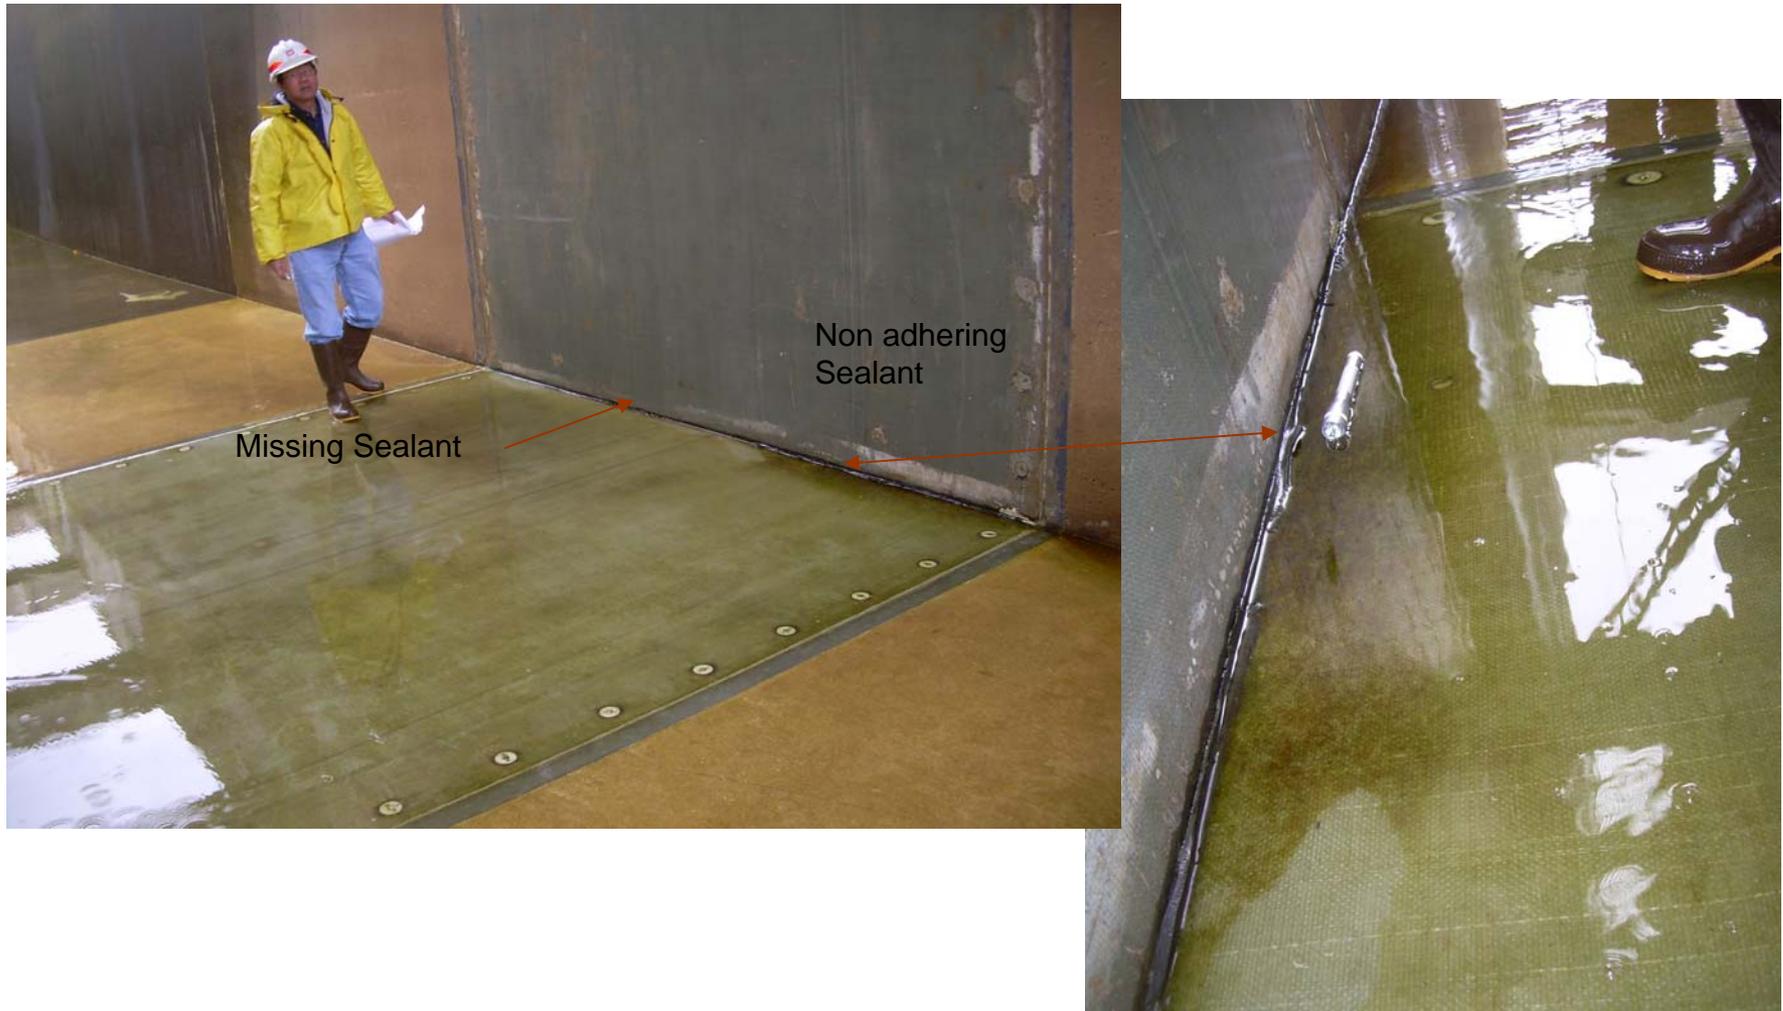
PIT Antennae Flexible Joint Sealant Missing or Not Adhering to Joint Between the Wall and Floor.
